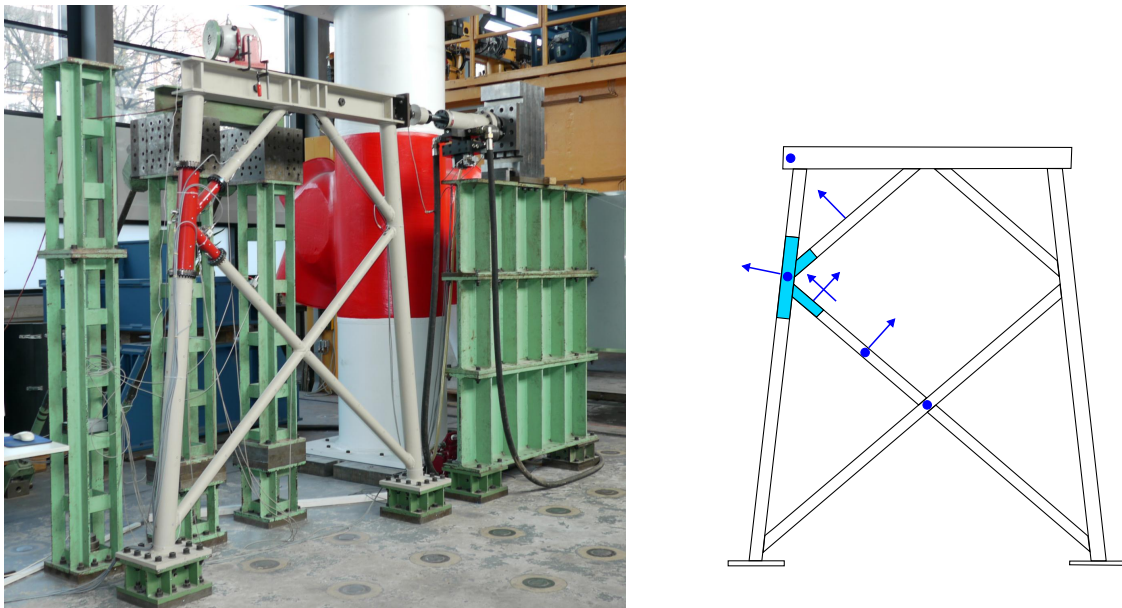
Laboratory testing structure (left) and sensor positions (right).
